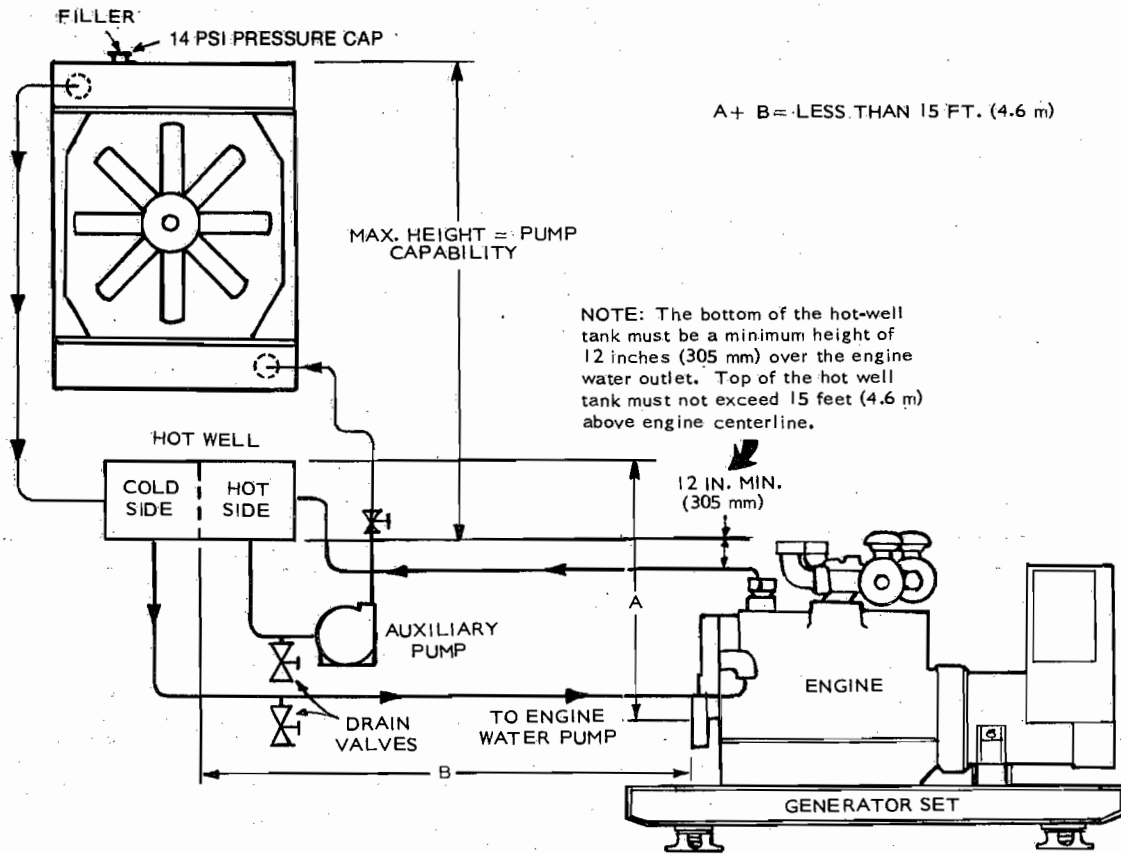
HIGH REMOTE RADIATOR INSTALLATION
